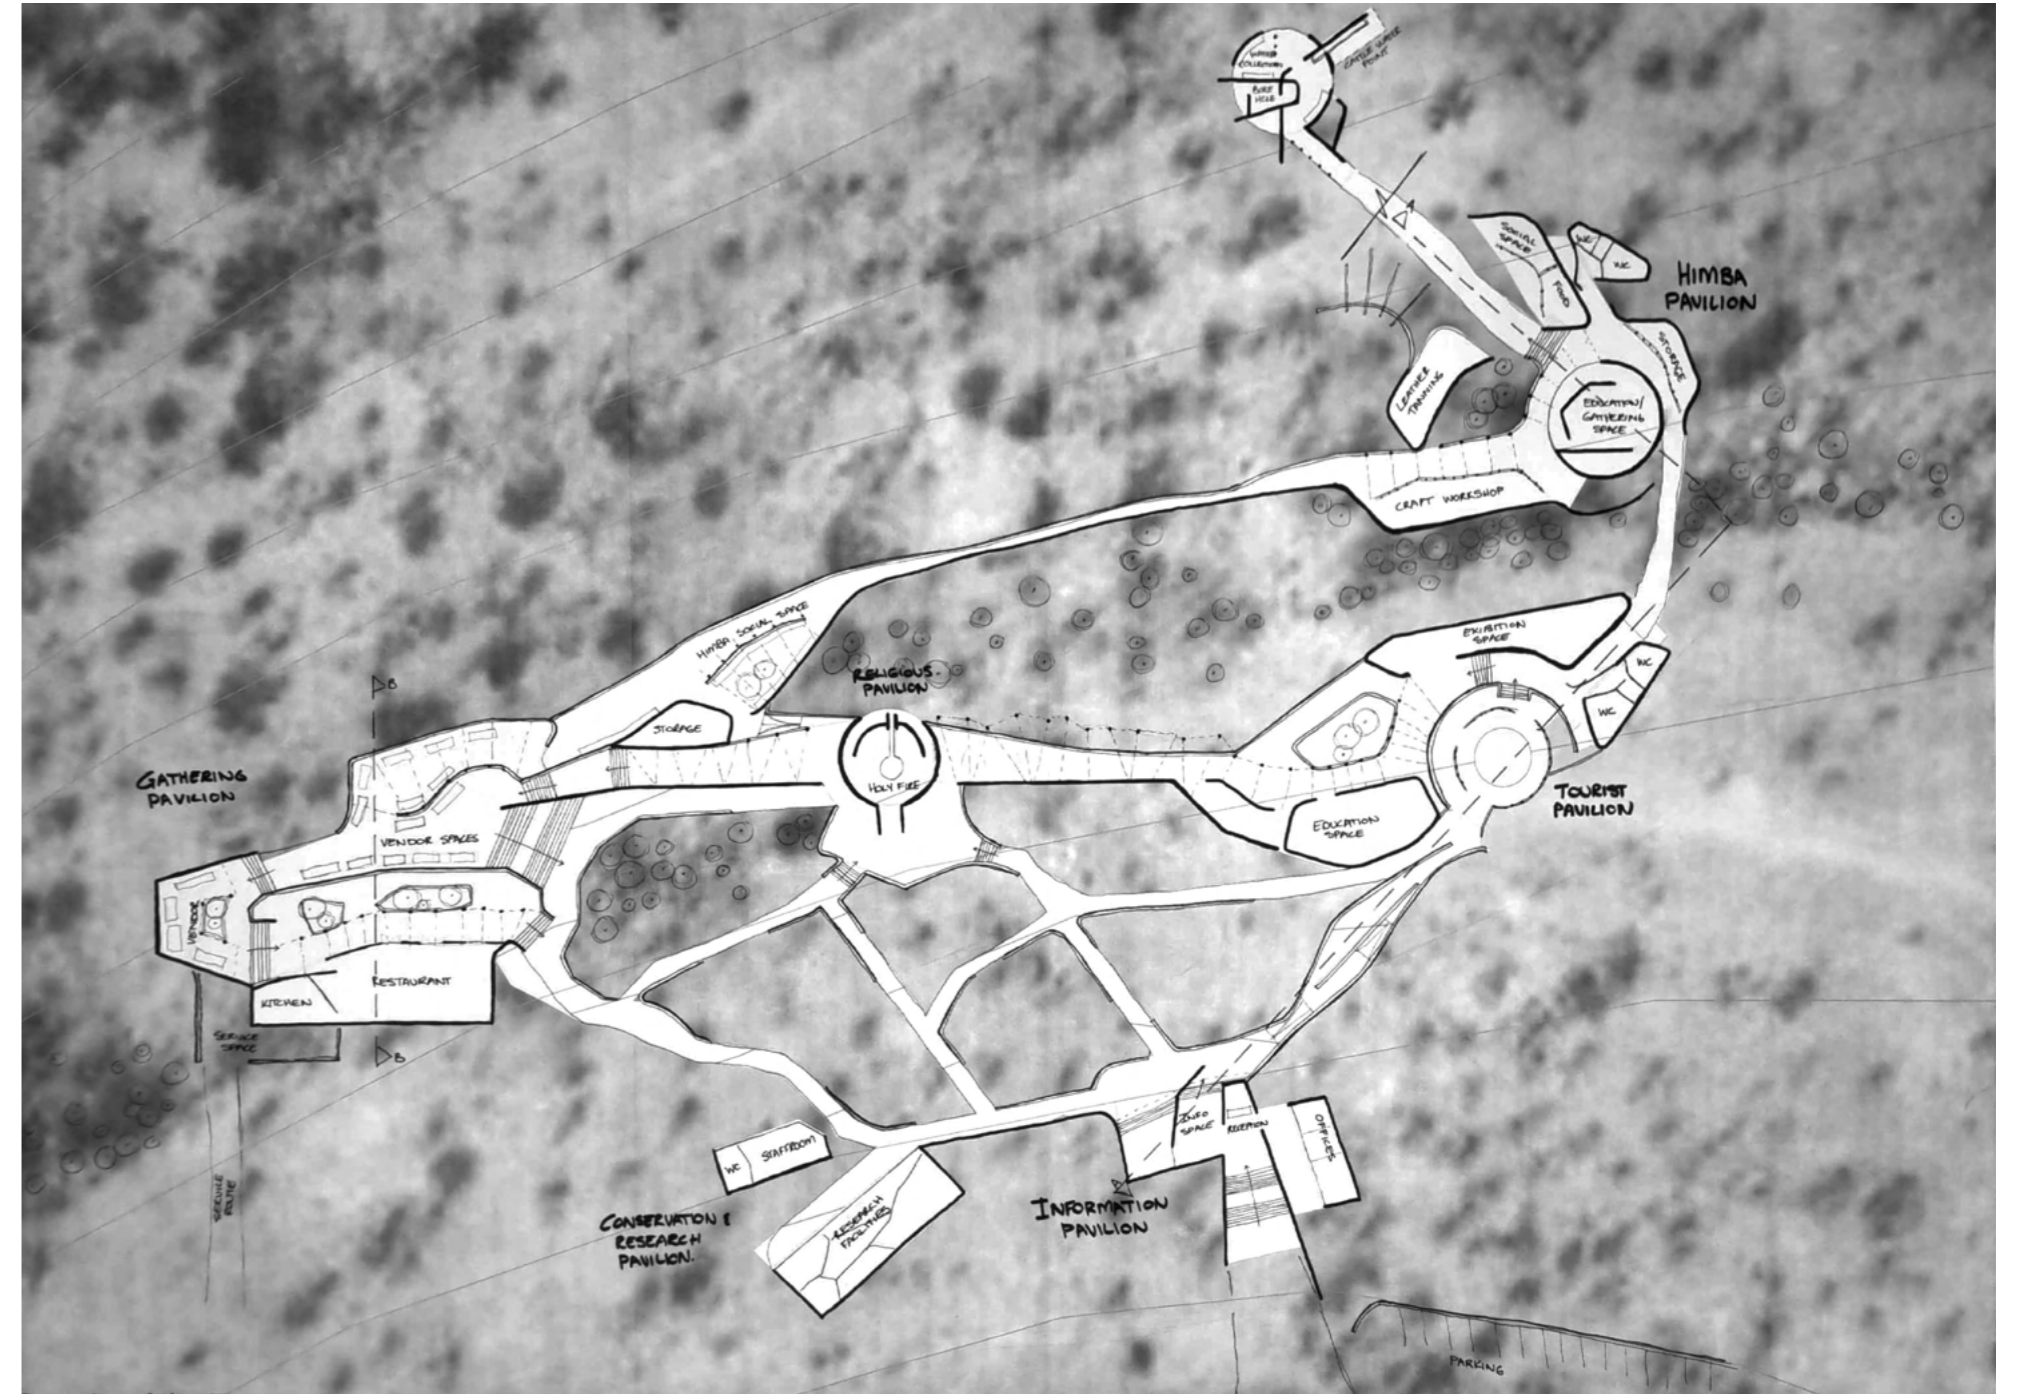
Design Approach 2 Plan Layout (Author, 2021)
